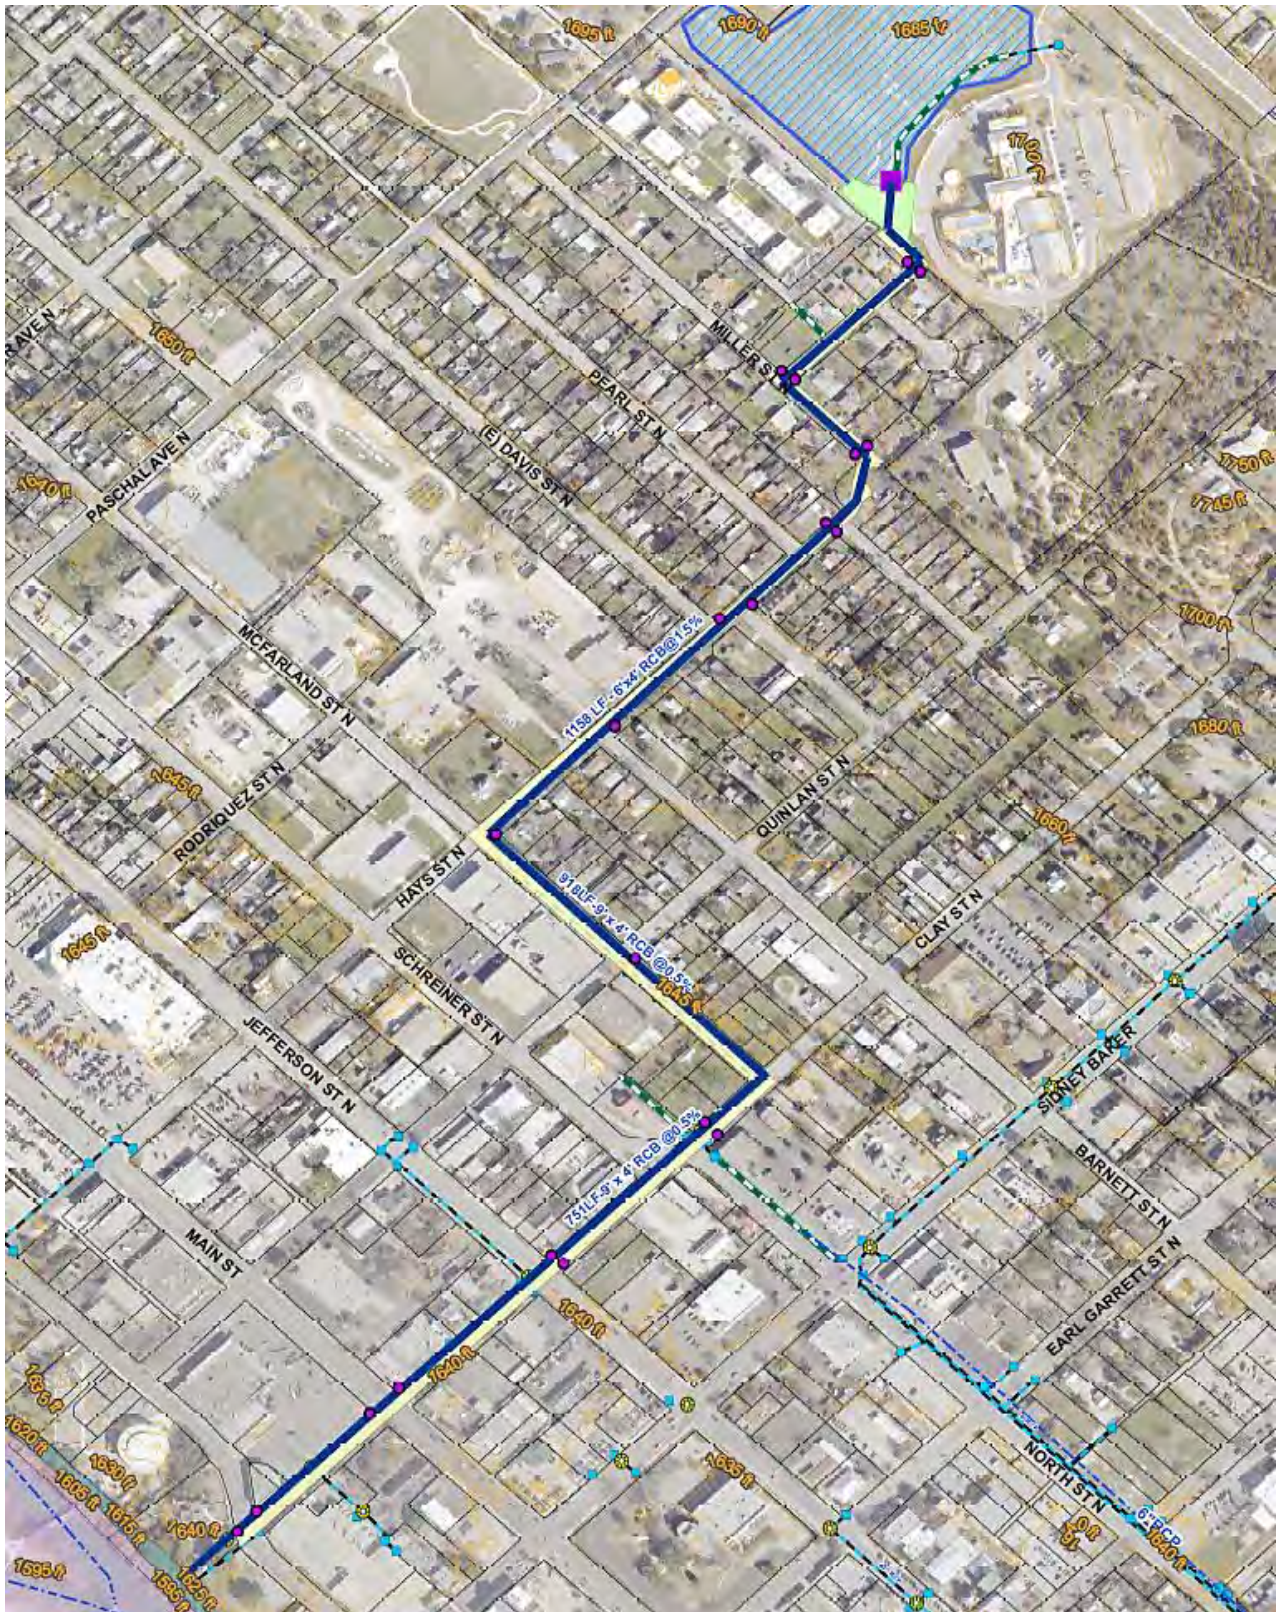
Conceptual Storm Drainage System for Kroc Center and Clay Street.
